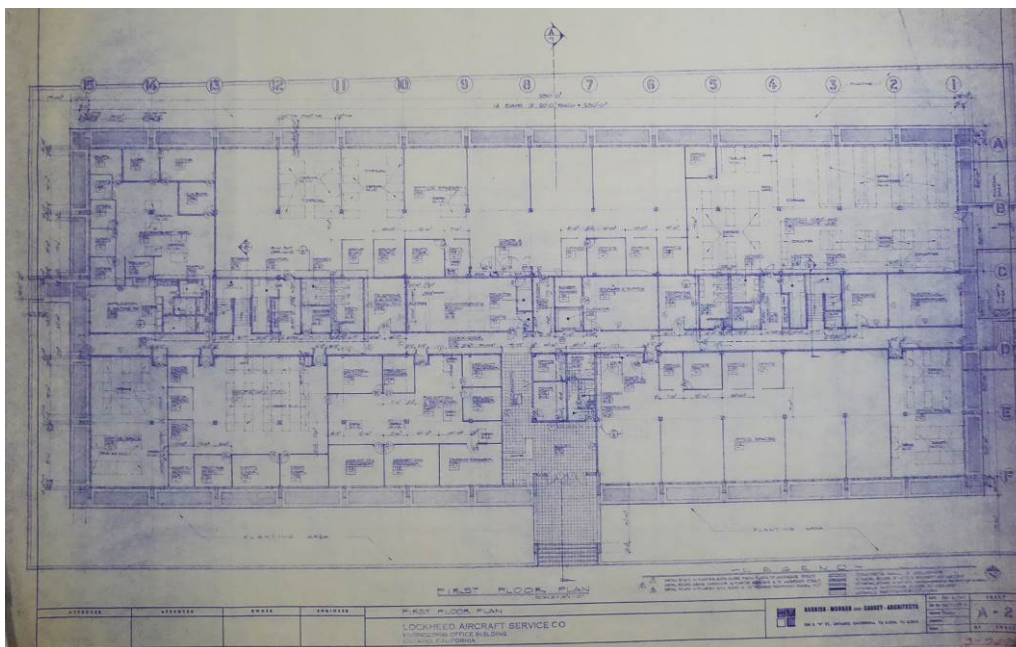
First floor plan. Architect's drawing, 1967. Source: LAWA records.
